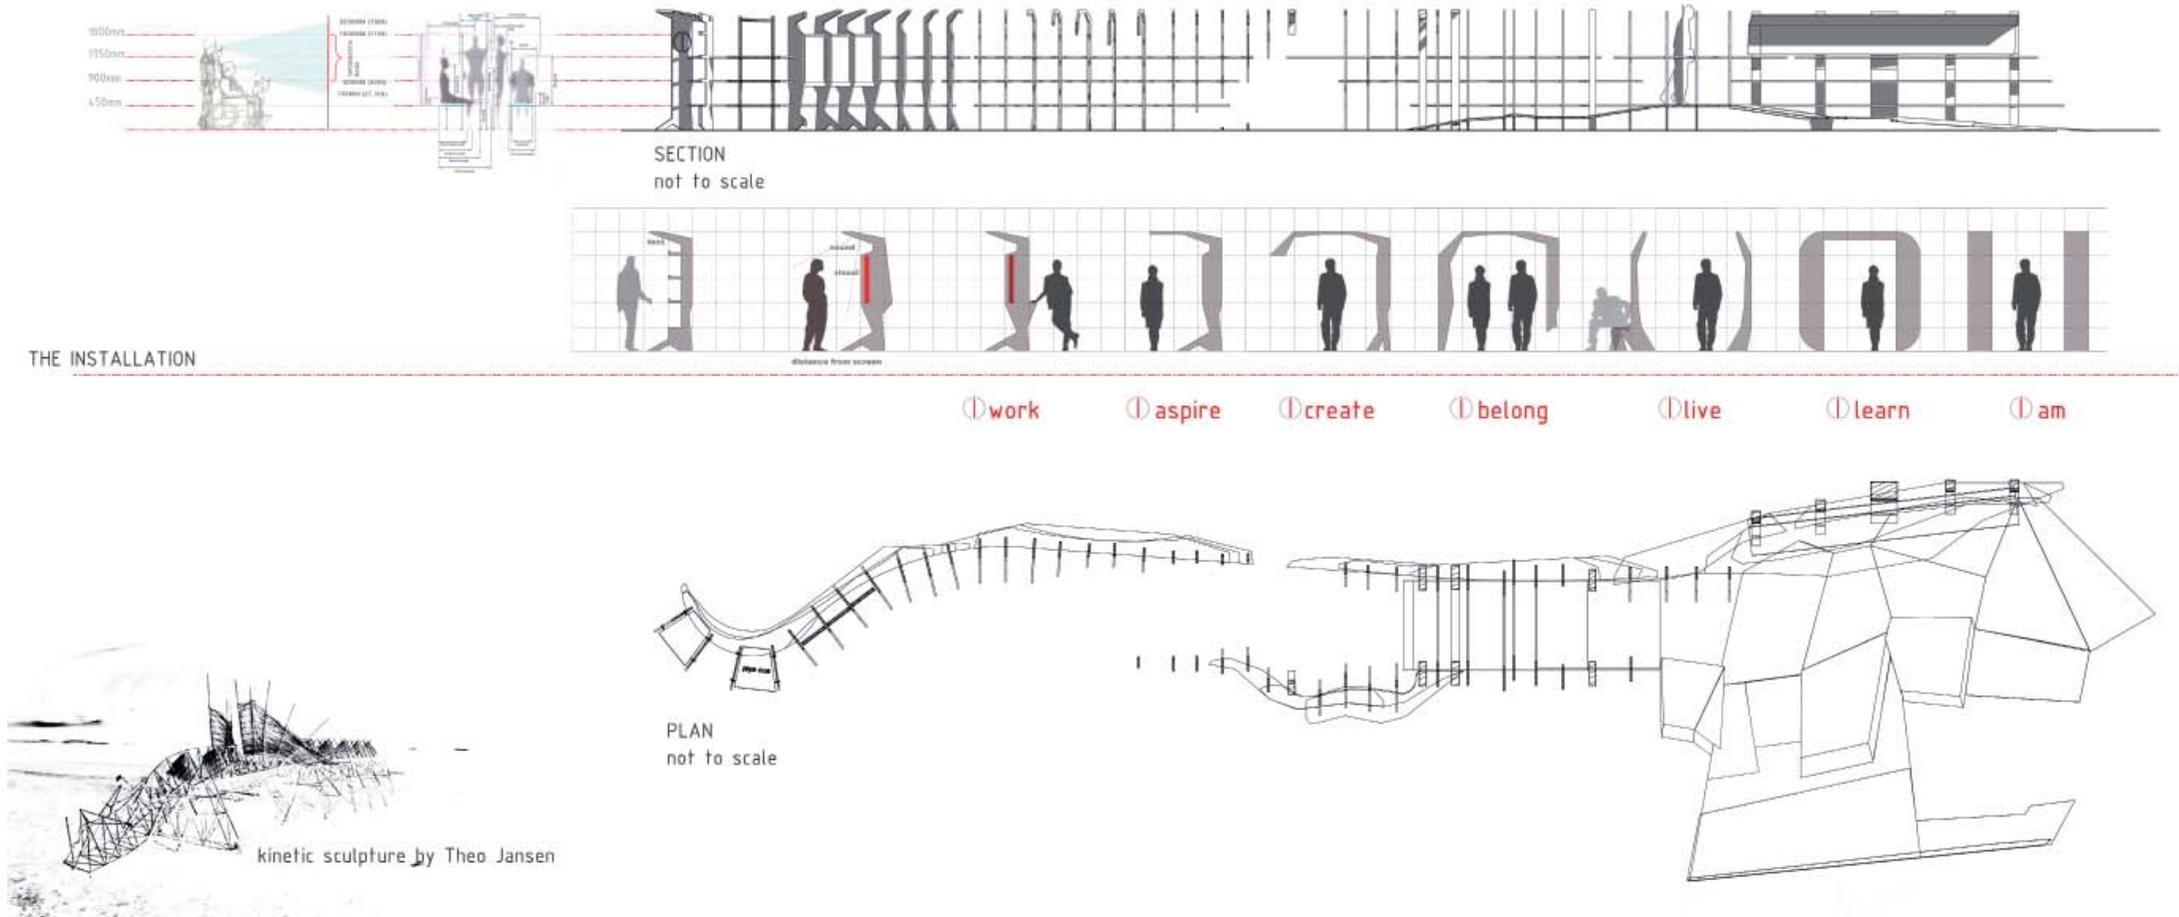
June 2011 general arrangement layout Exhibition 1, SCC
